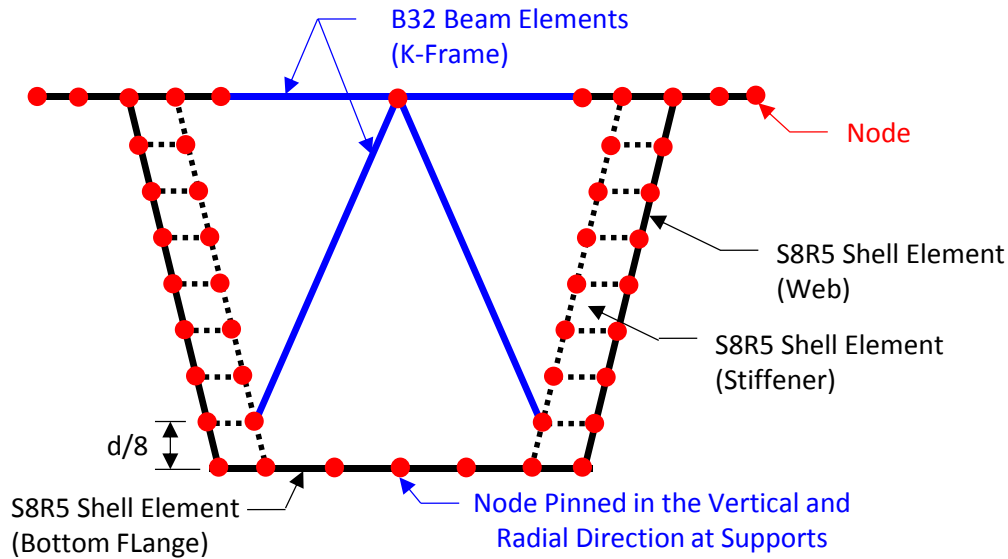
Cross-Sections of FE Model for the Tub Girder Parametric Study
